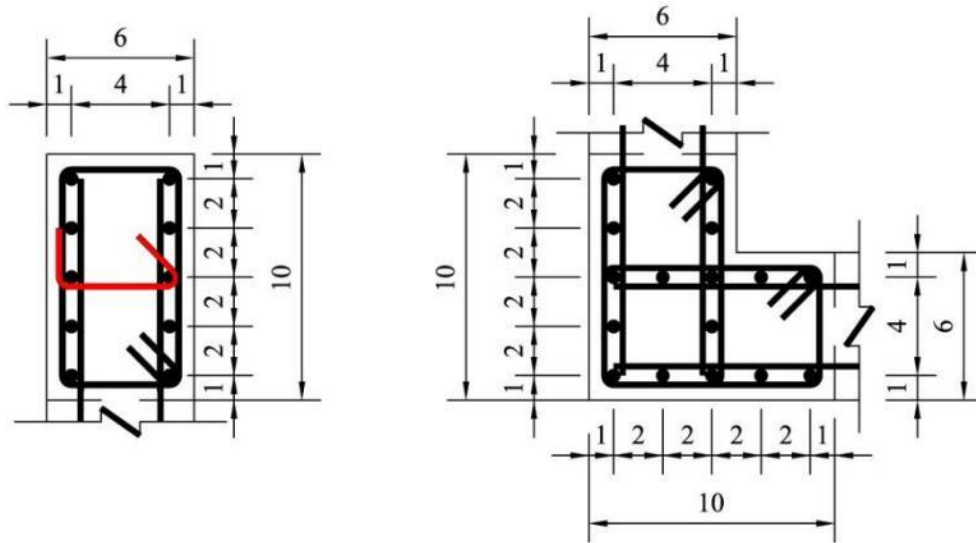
CWall Boundary Element Reinforcement Details (Units: inches)
